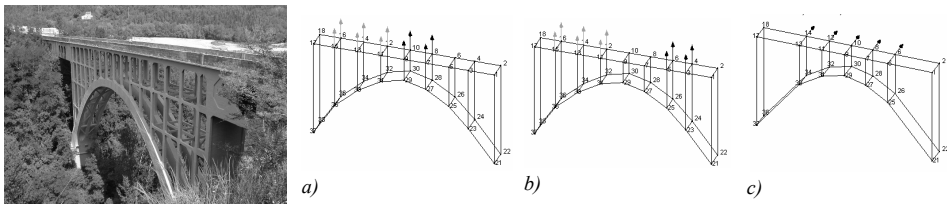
General view of Villa Passo Bridge and accelerometers lay-outs.
